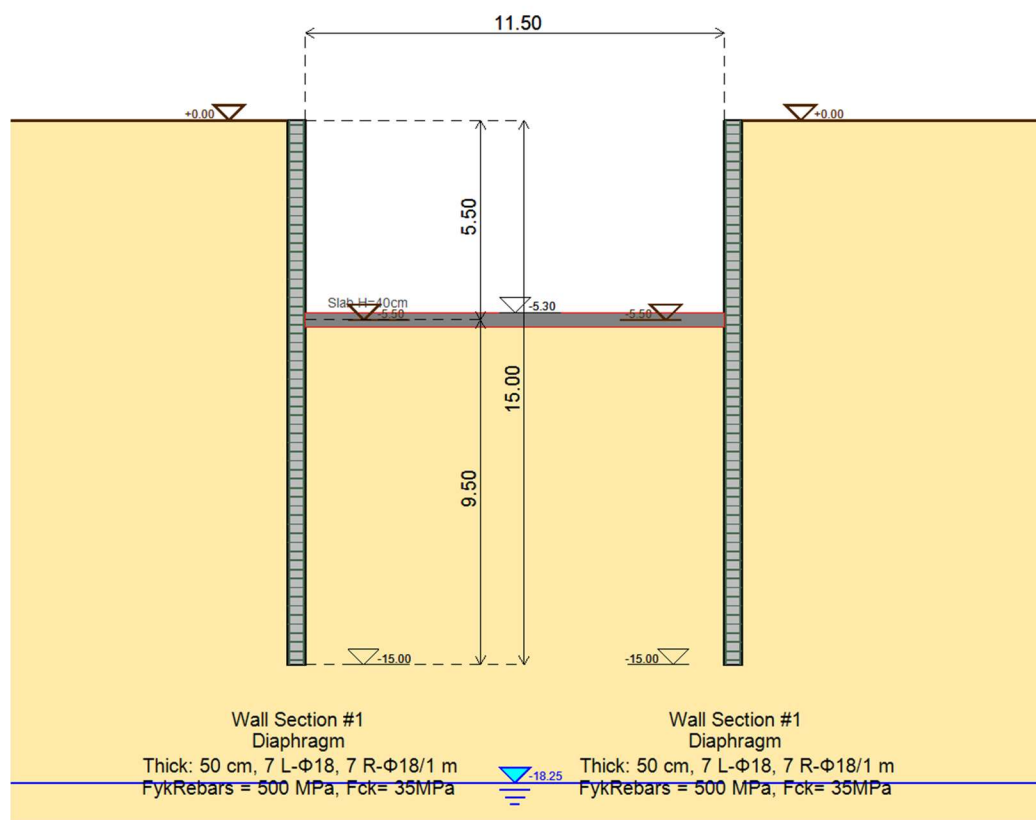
Example of a cantilever-supported diaphragm wall in an excavation.
